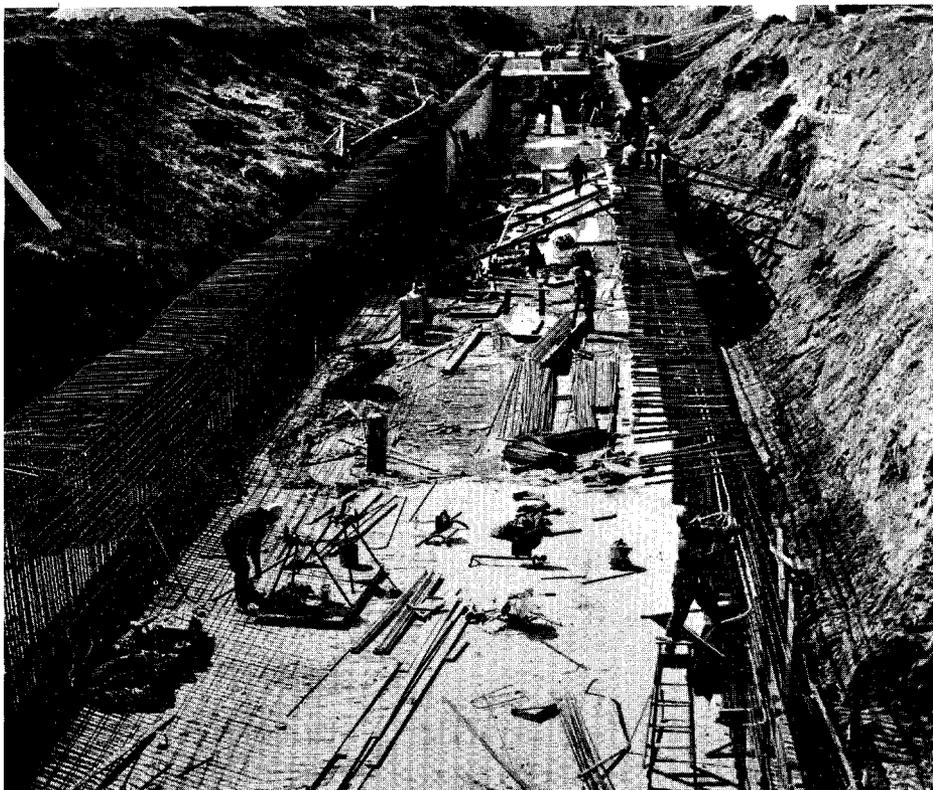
Reinforcing steel for the walls of the Transfer Hall.
